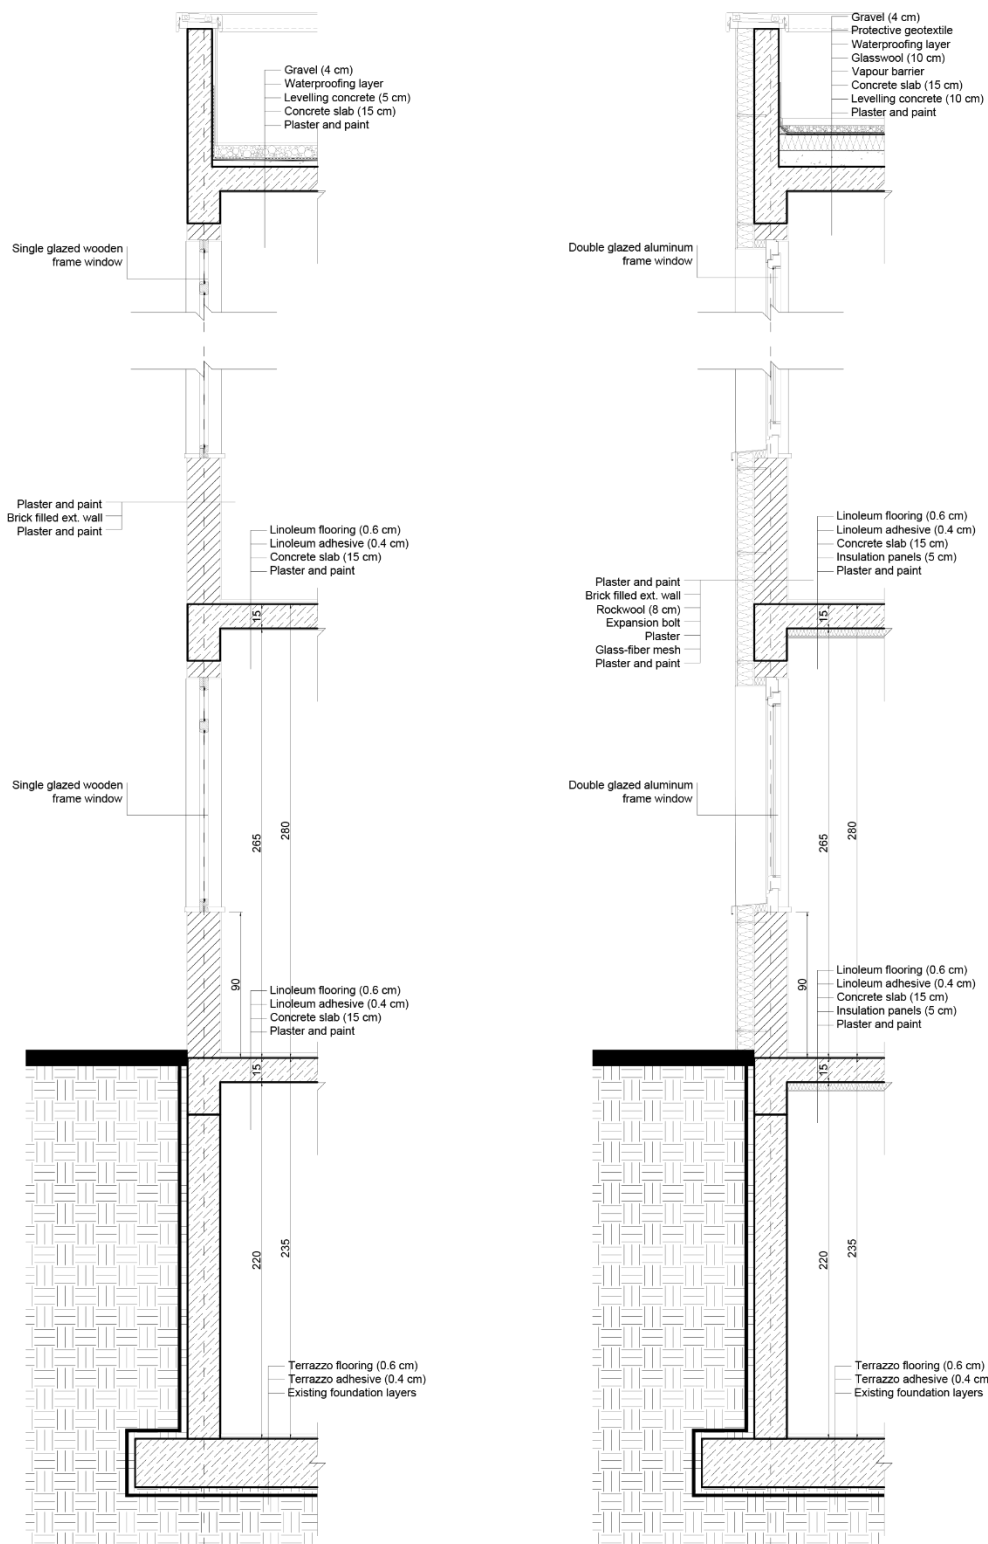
System detail drawings of high-rise buildings (Left, existing; Right, refurbished)
